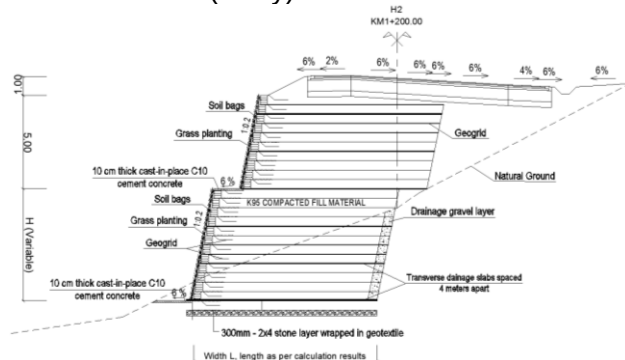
Typical cross-sectional calculation at the location utilizing mechanically stabilized earth walls
